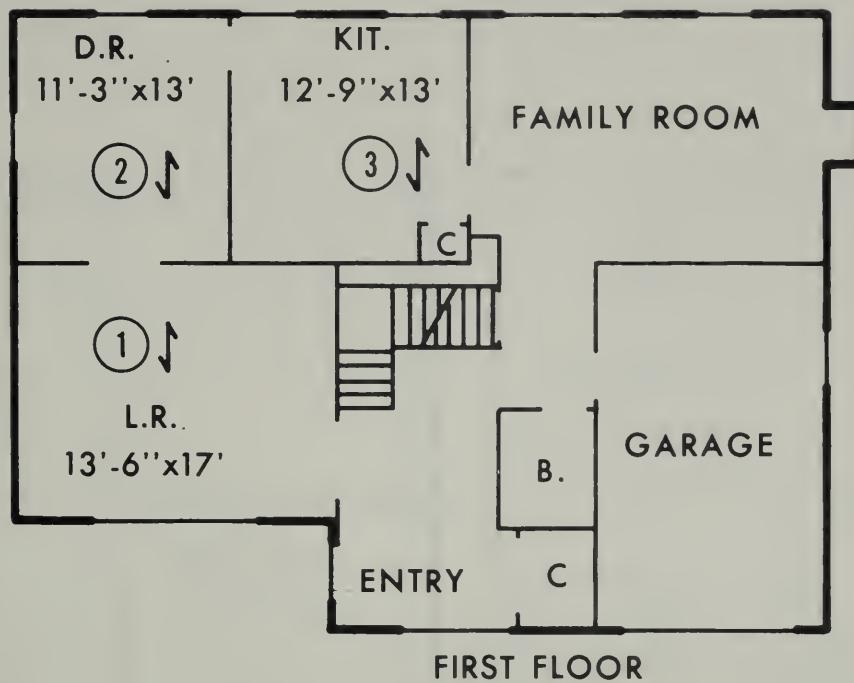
FLOOR PLAN OF HOUSE NO. 2
